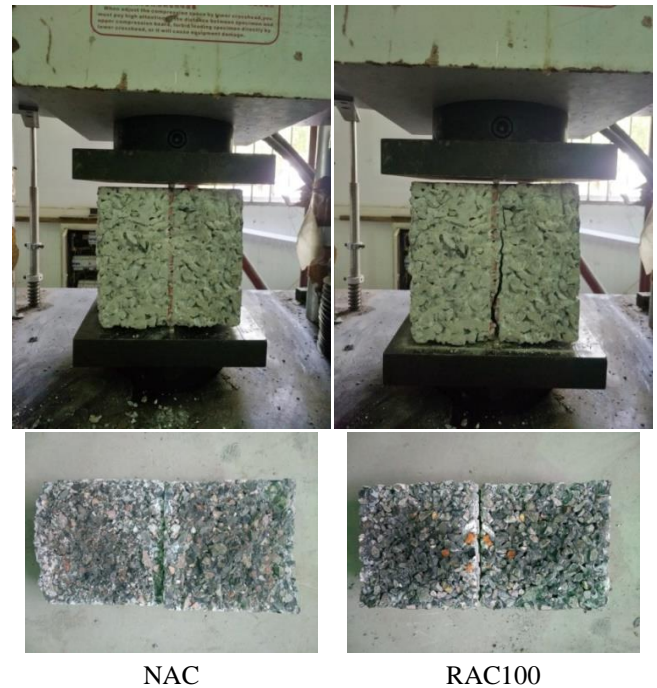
Failure of pervious concrete specimen under splitting tensile test
